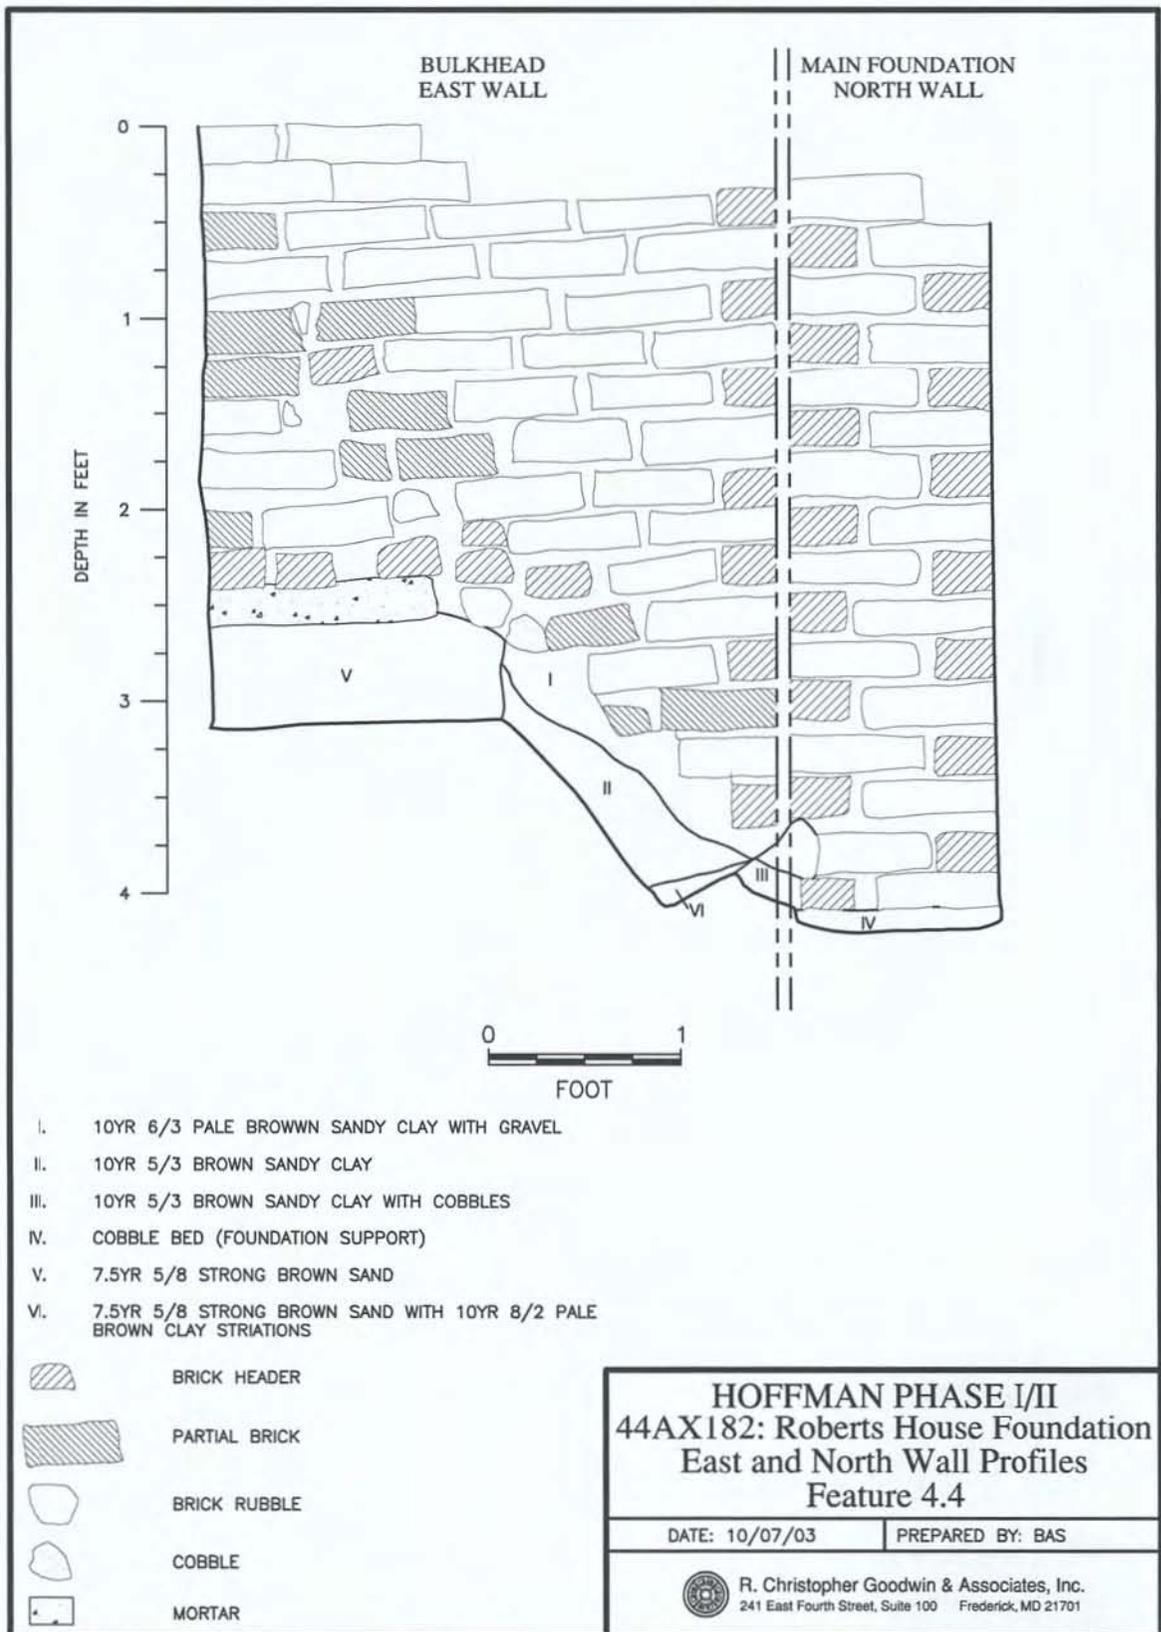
Test Unit 14: Profile of east wall, bulkhead entrance
